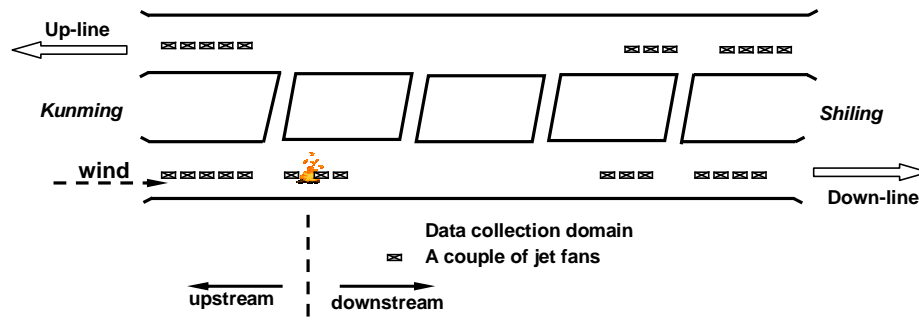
Plan view of the *Yangzong Road Tunnel* (not to scale).
